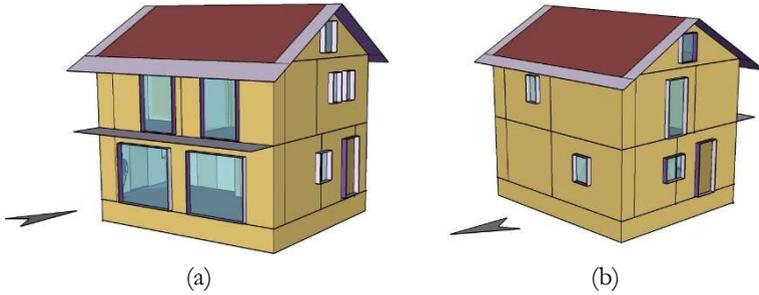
EnergyPlus Model in SketchUp. a) South/East façades; b) North/West façades
